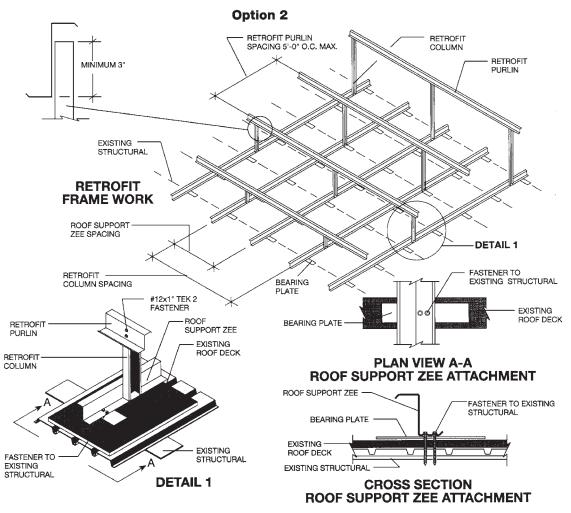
Option 2: Retrofit framing over existing roof purlins—a general case. (MBCI.)
